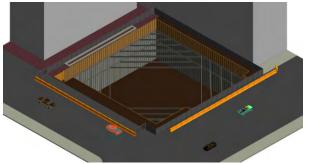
SUBSTRUCTURE DIAGONAL BRACING
